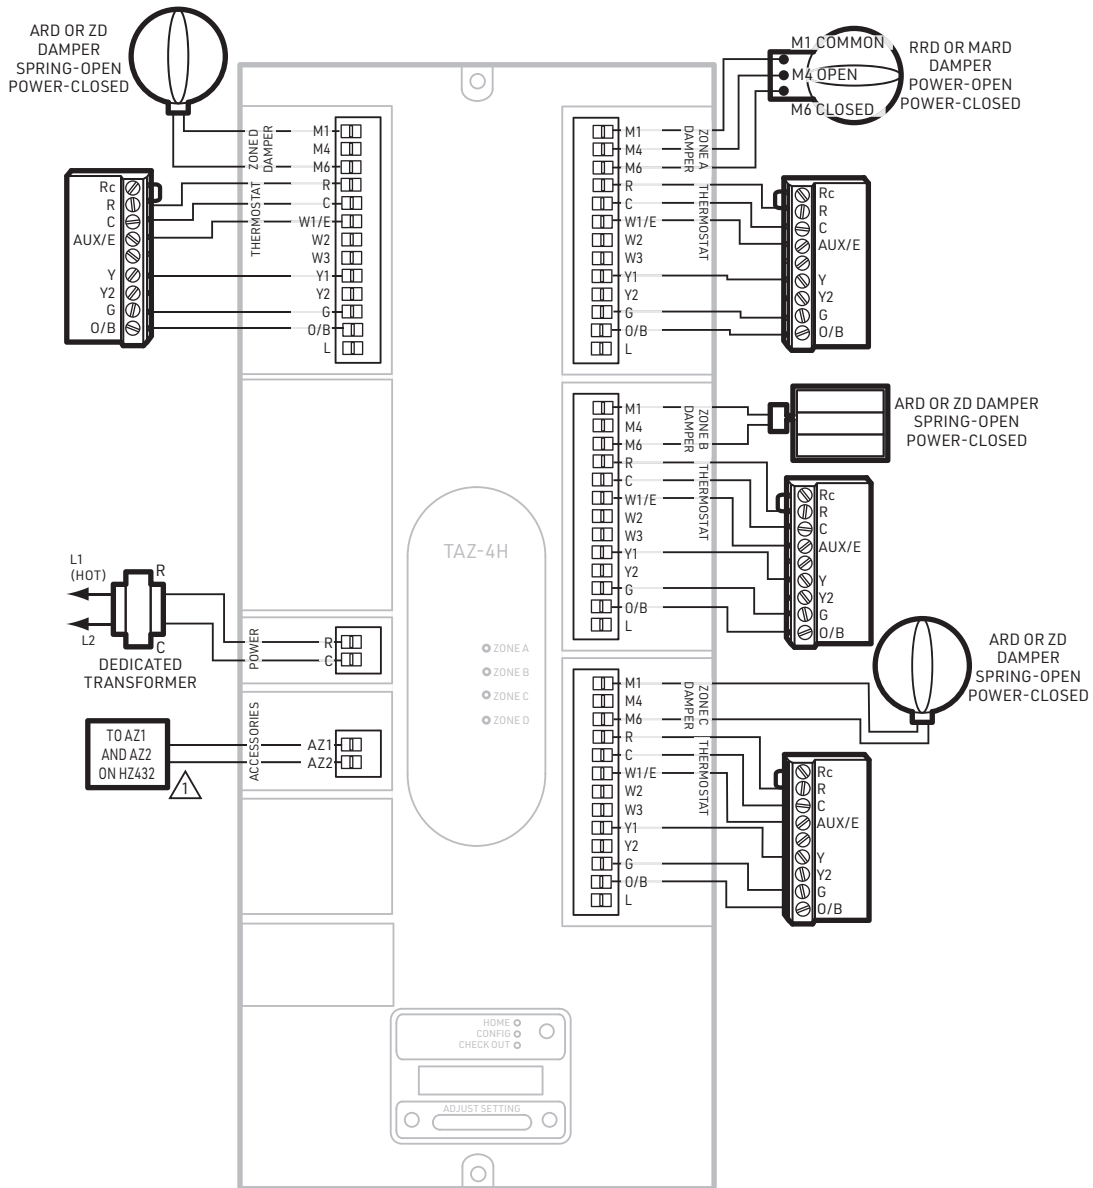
Zone panel wiring heat pump, 3 heat/2 cool with electric stage 3 heat.
